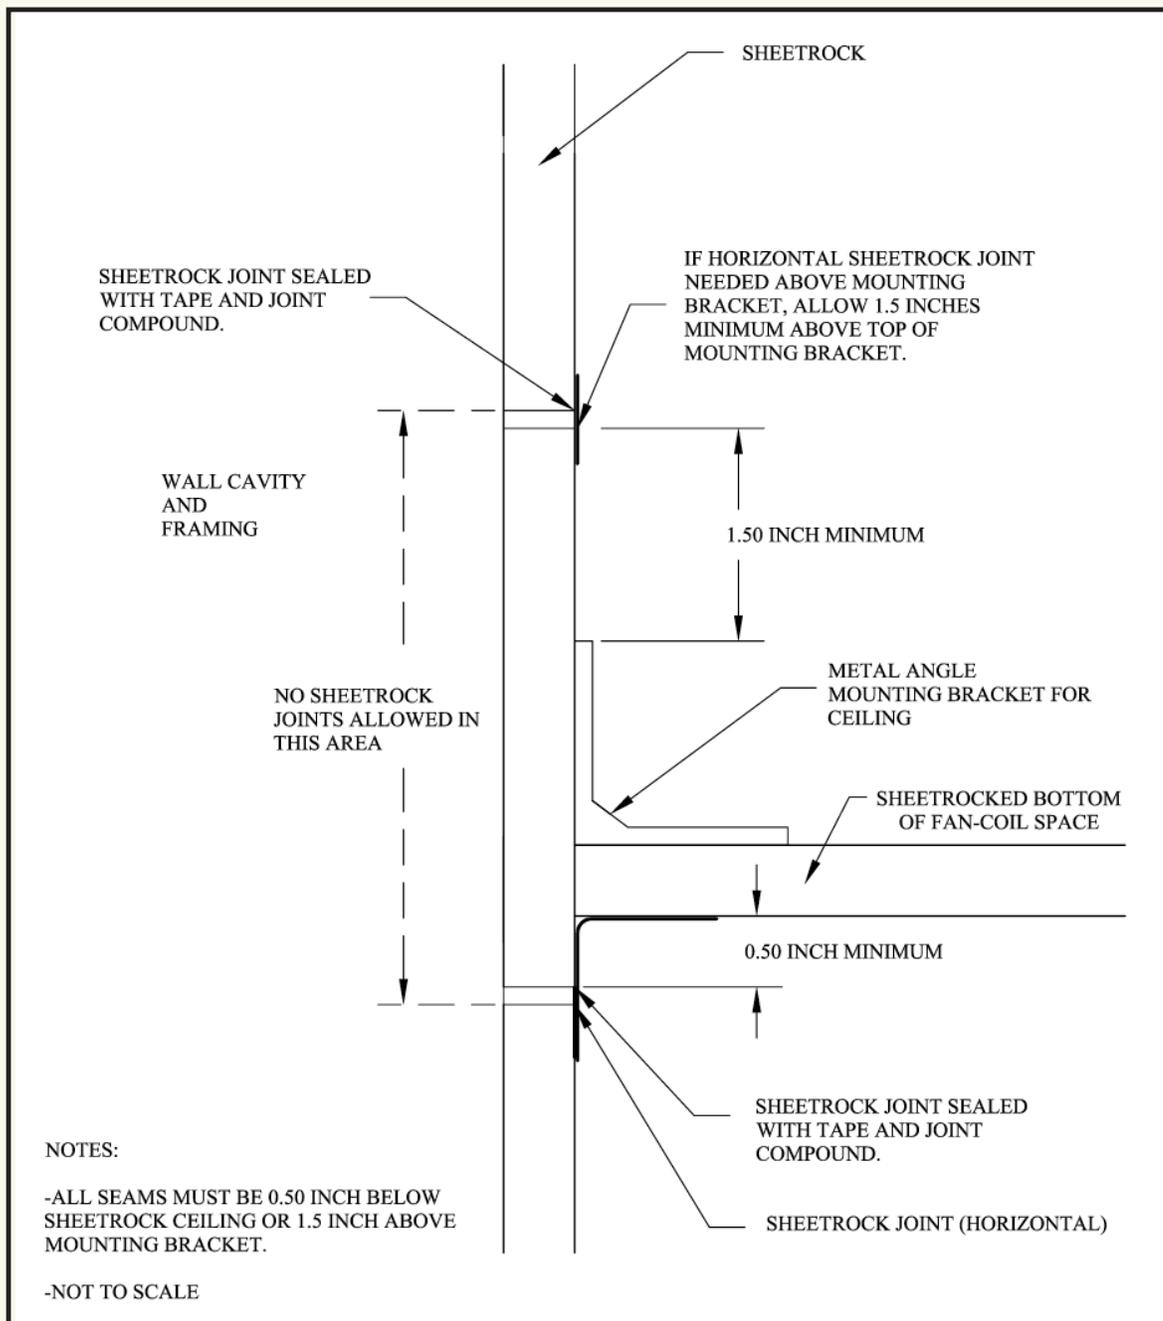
Cross section drywall details for fire code separation for multi-family, non-ducted ceiling returns for fan coil units – Metal Bracket
